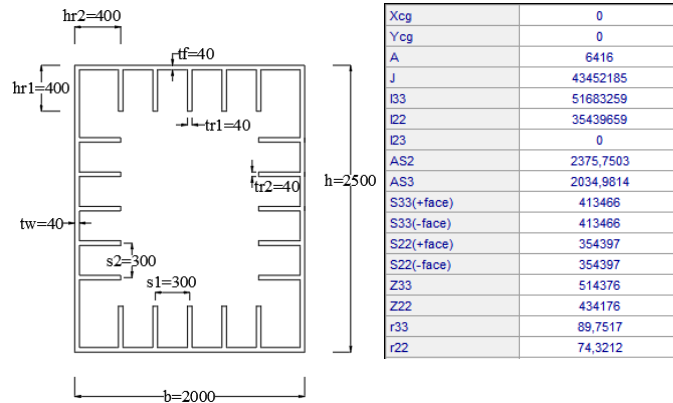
Tie Beam Box Girder 2000x2000x40x65
